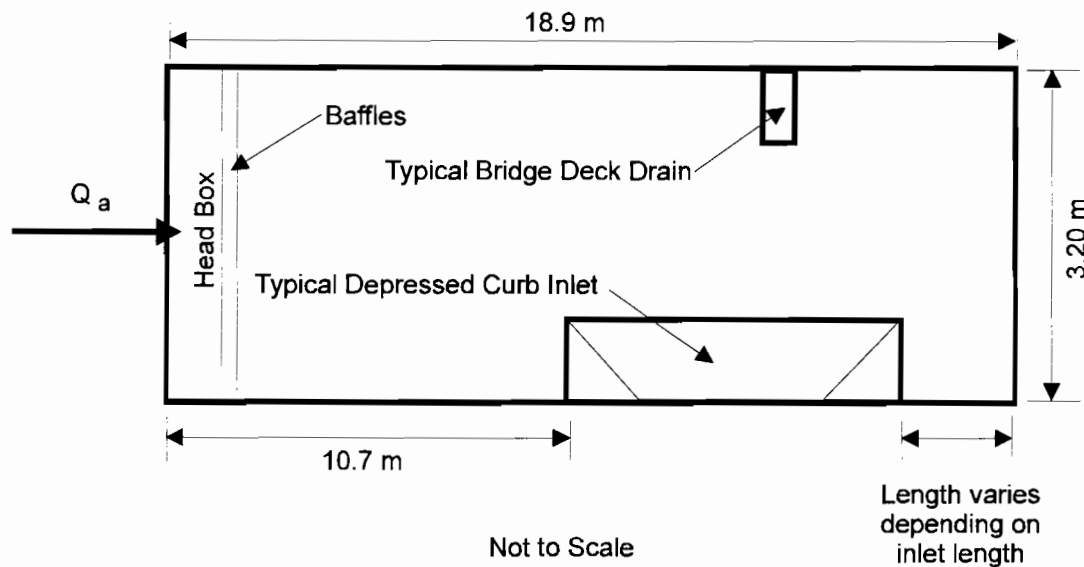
Plan View of Roadway Model (Model Dimensions)
